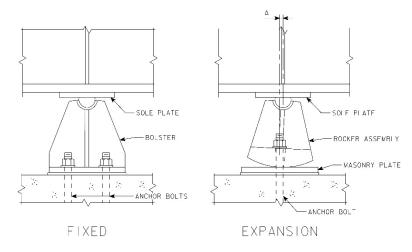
Steel Fixed Bolster and Steel Rocker Bearings
